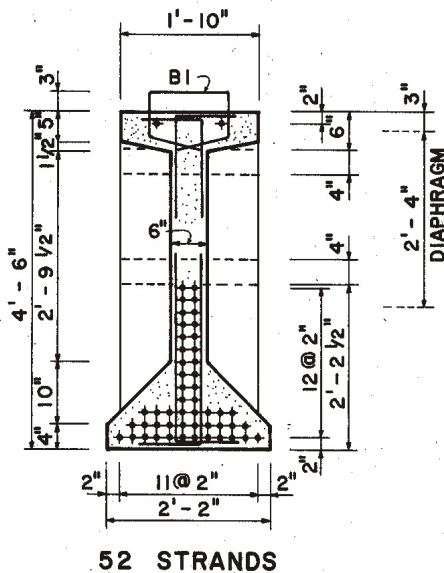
Cross section of BPR-designed prestressed-concrete beam, 1954. Georgia's early beams were based on the BPR's work. Source: Nasser (1979).
